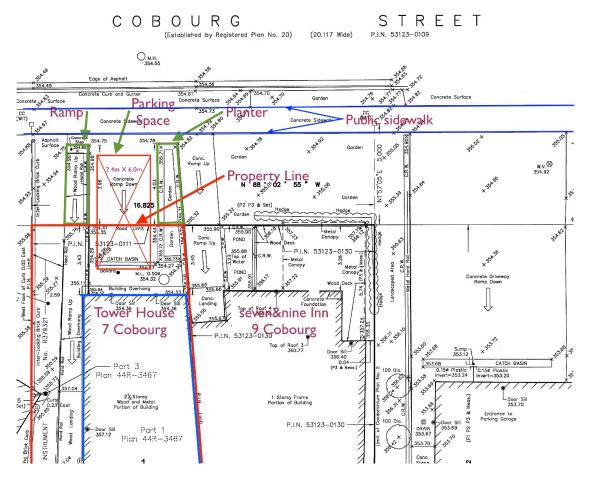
Detail of 7 Cobourg front yard showing existing ramp and retaining wall/planter.
